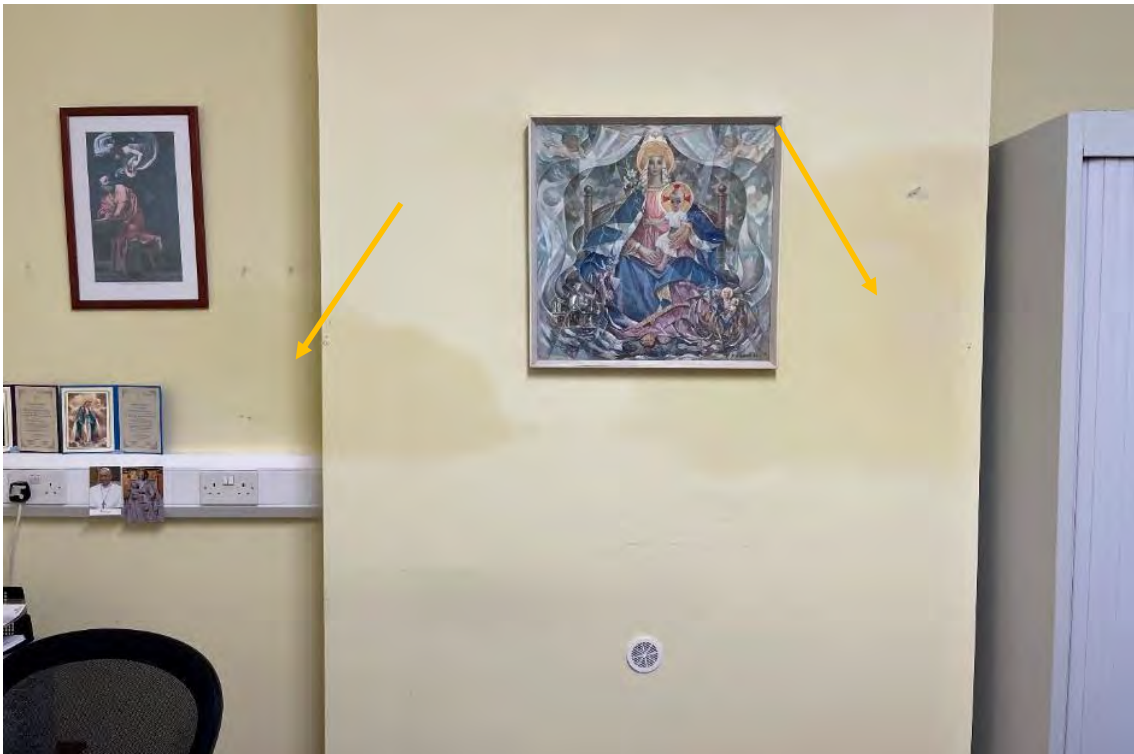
(Below): General overview of ground floor areas to 1 Hamilton Road which would benefit from redecoration and renewal of floor finishes within the next 5 years.
